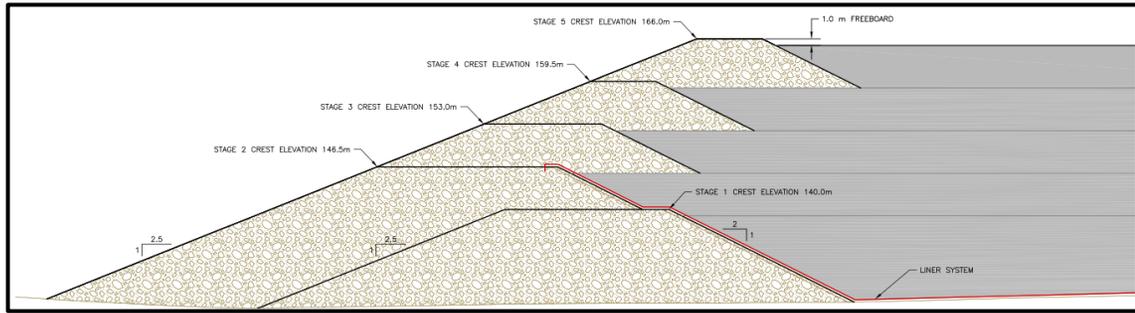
TSF2 Embankment Section, Tierra Group Aug 2025
